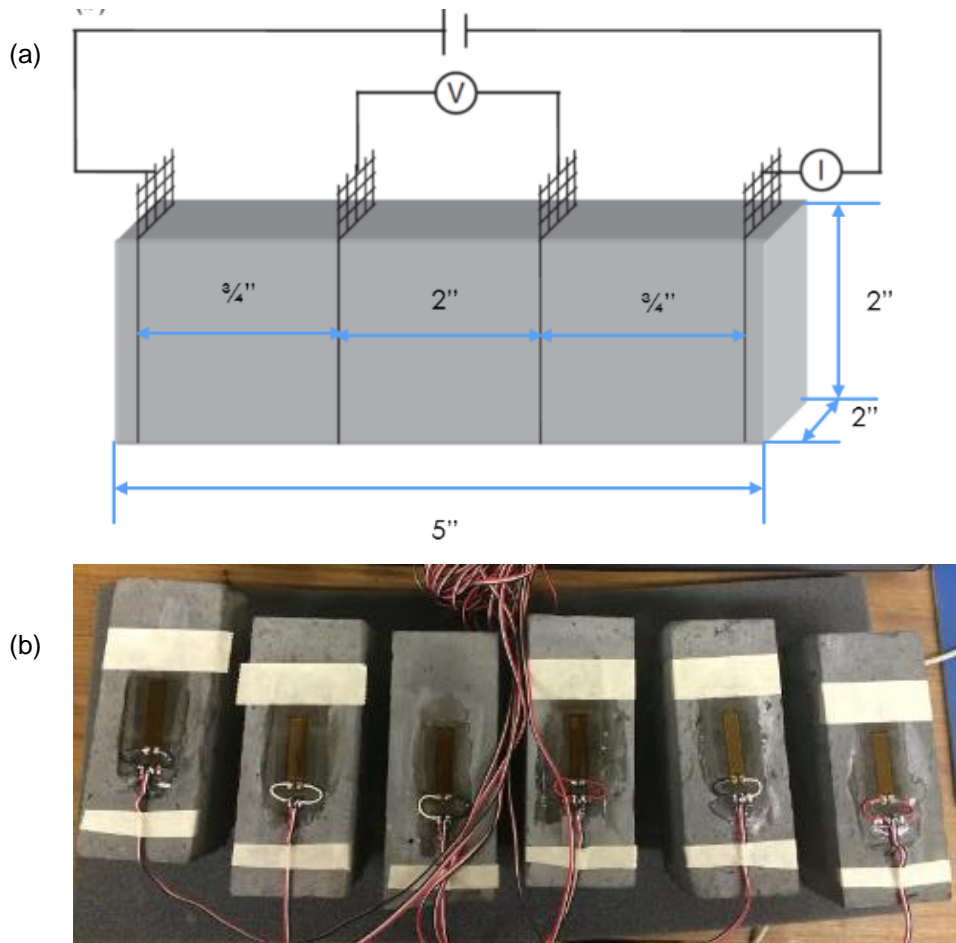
(a) Dimensions of specimens and arrangement of electrodes; and (b) Installation of strain gages
